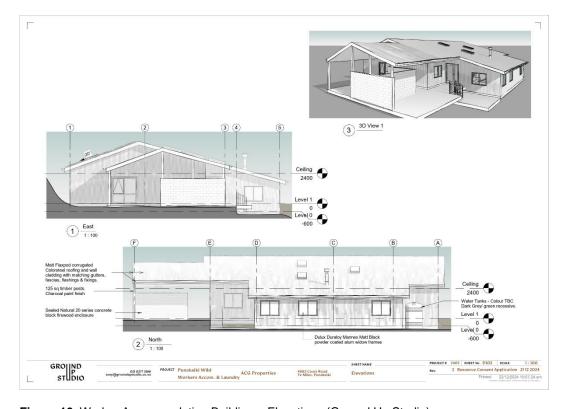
Worker Accommodation Building – Elevations (Ground Up Studio)
